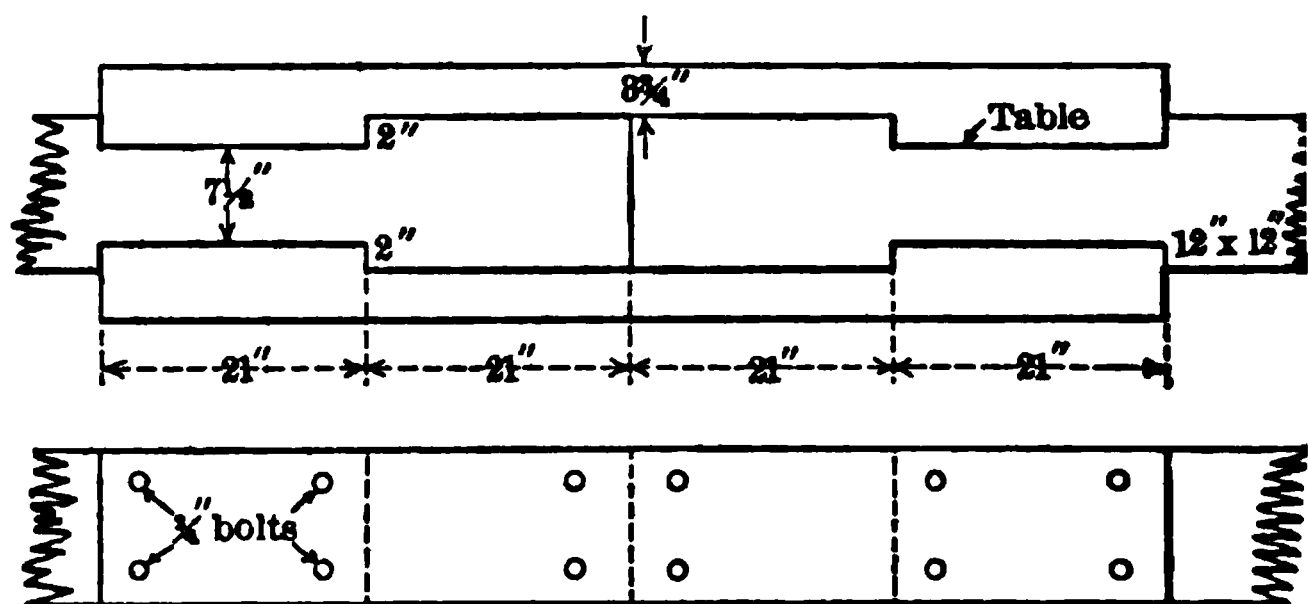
A. Alternate Detail for Splice of Bottom Chord
